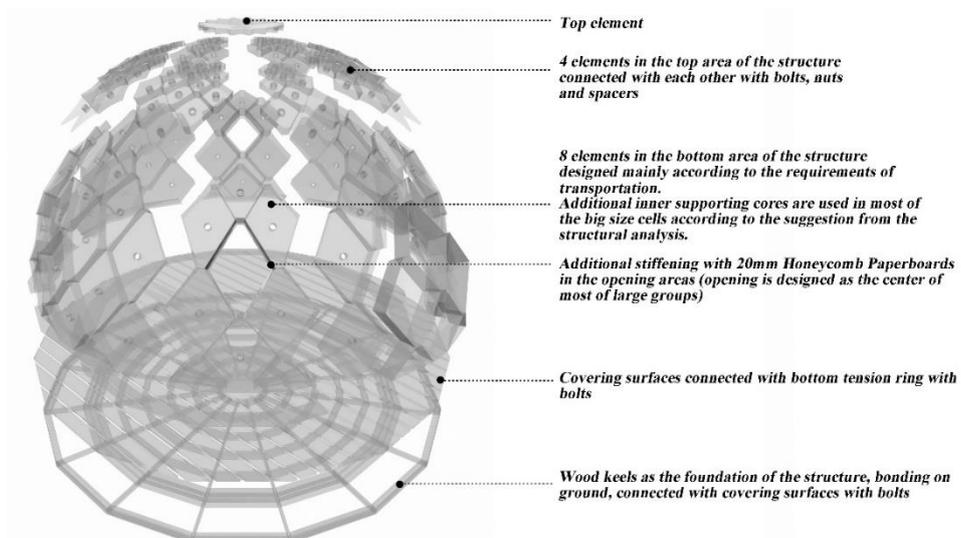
11 Plan of the subdivision of the whole structure into 13 small building groups
